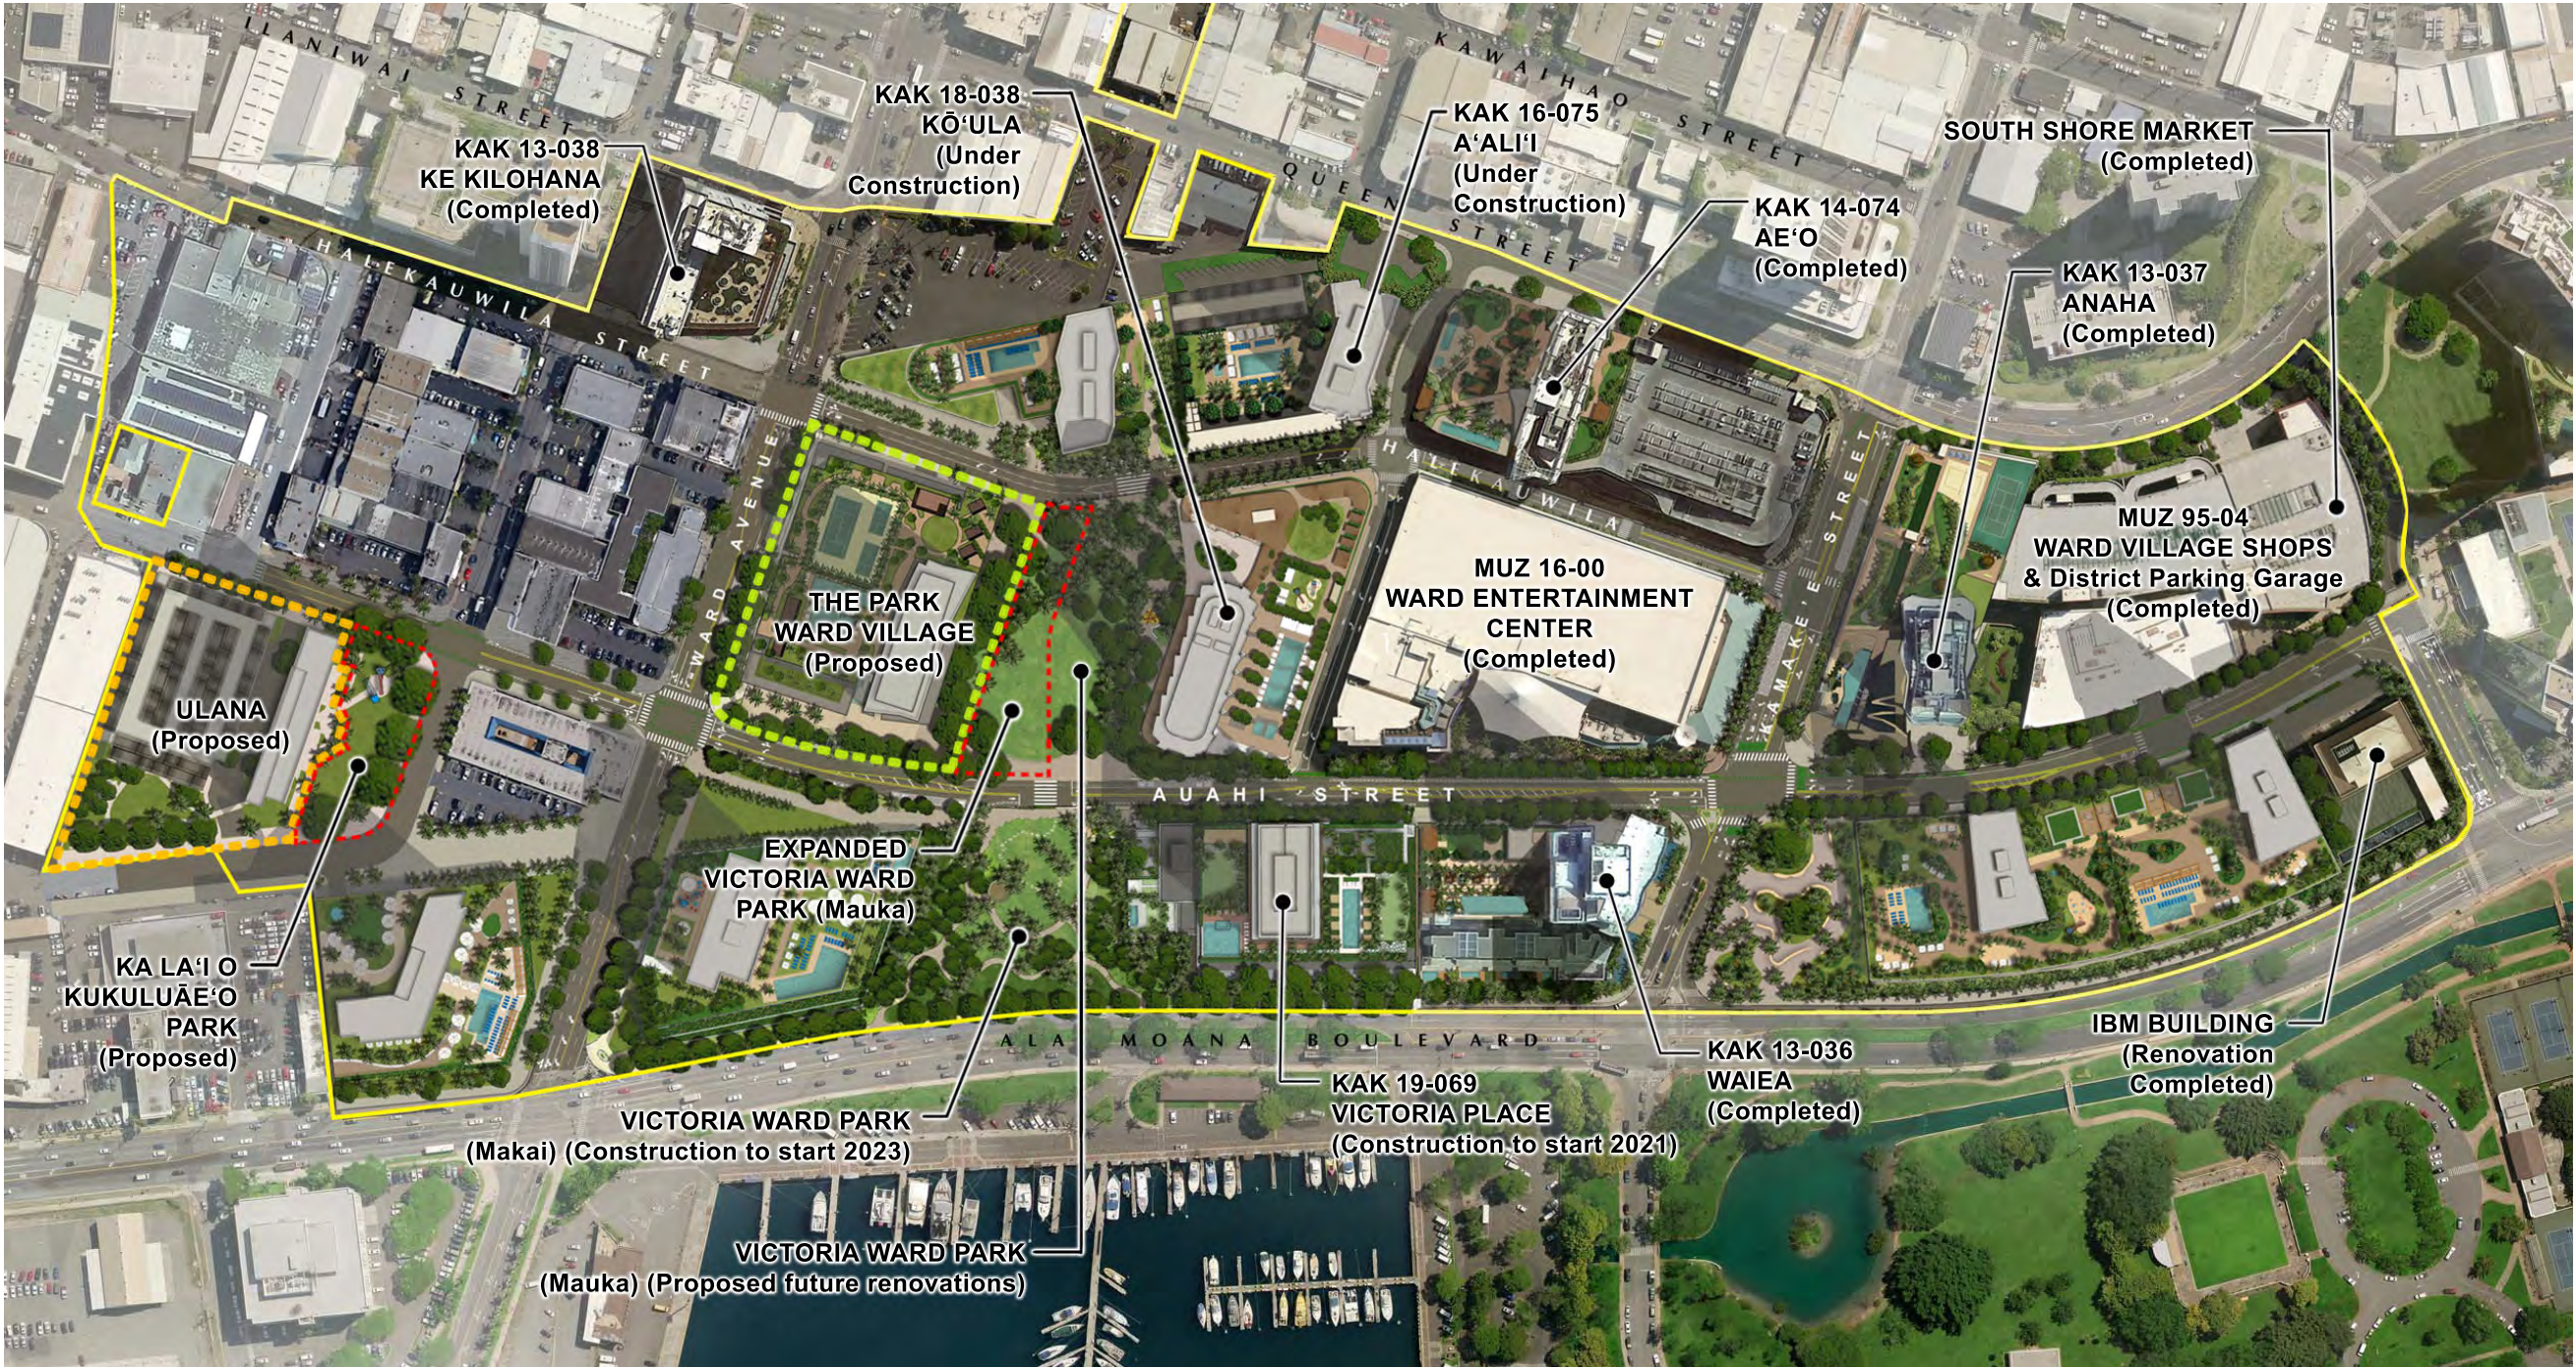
Ward Village tomorrow; current plans showing potential buildout of the Ward MP.
